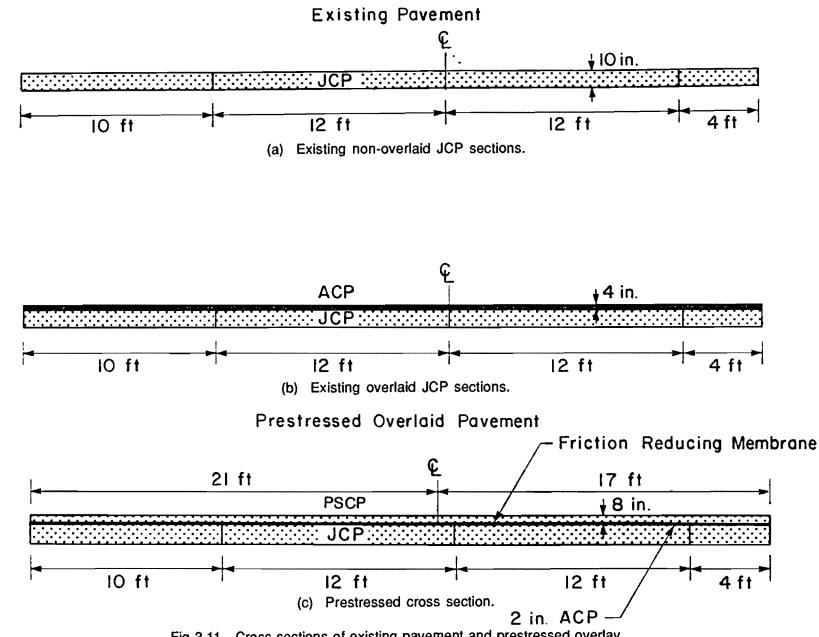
Cross sections of existing pavement and prestressed overlay.
